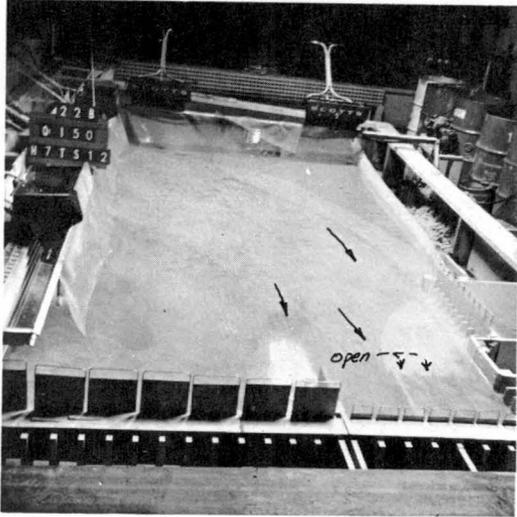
Scheme A Modification I during test with shortened outer divide wall. The difference in tunnel top elevation between the extension and existing sluice tunnels can be seen.
